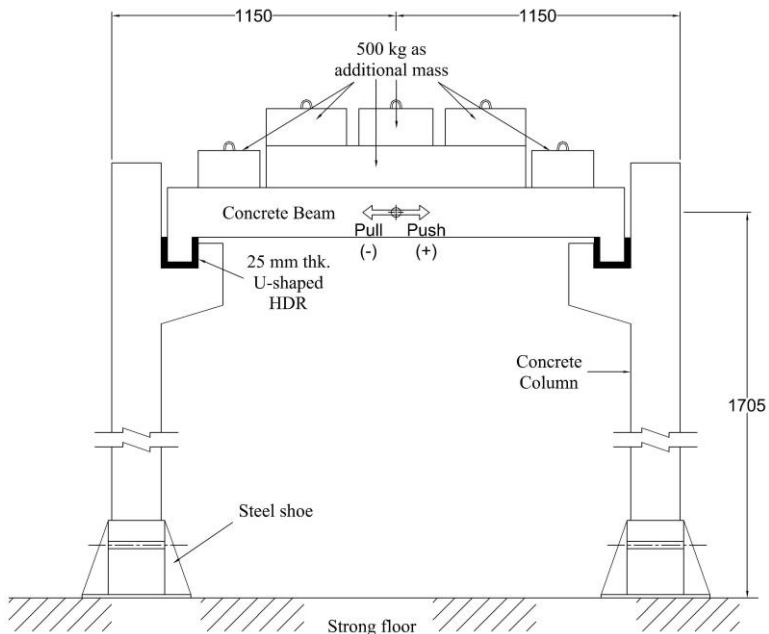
Tests setup for precast frame with U-shaped HDR beam-column joint.
